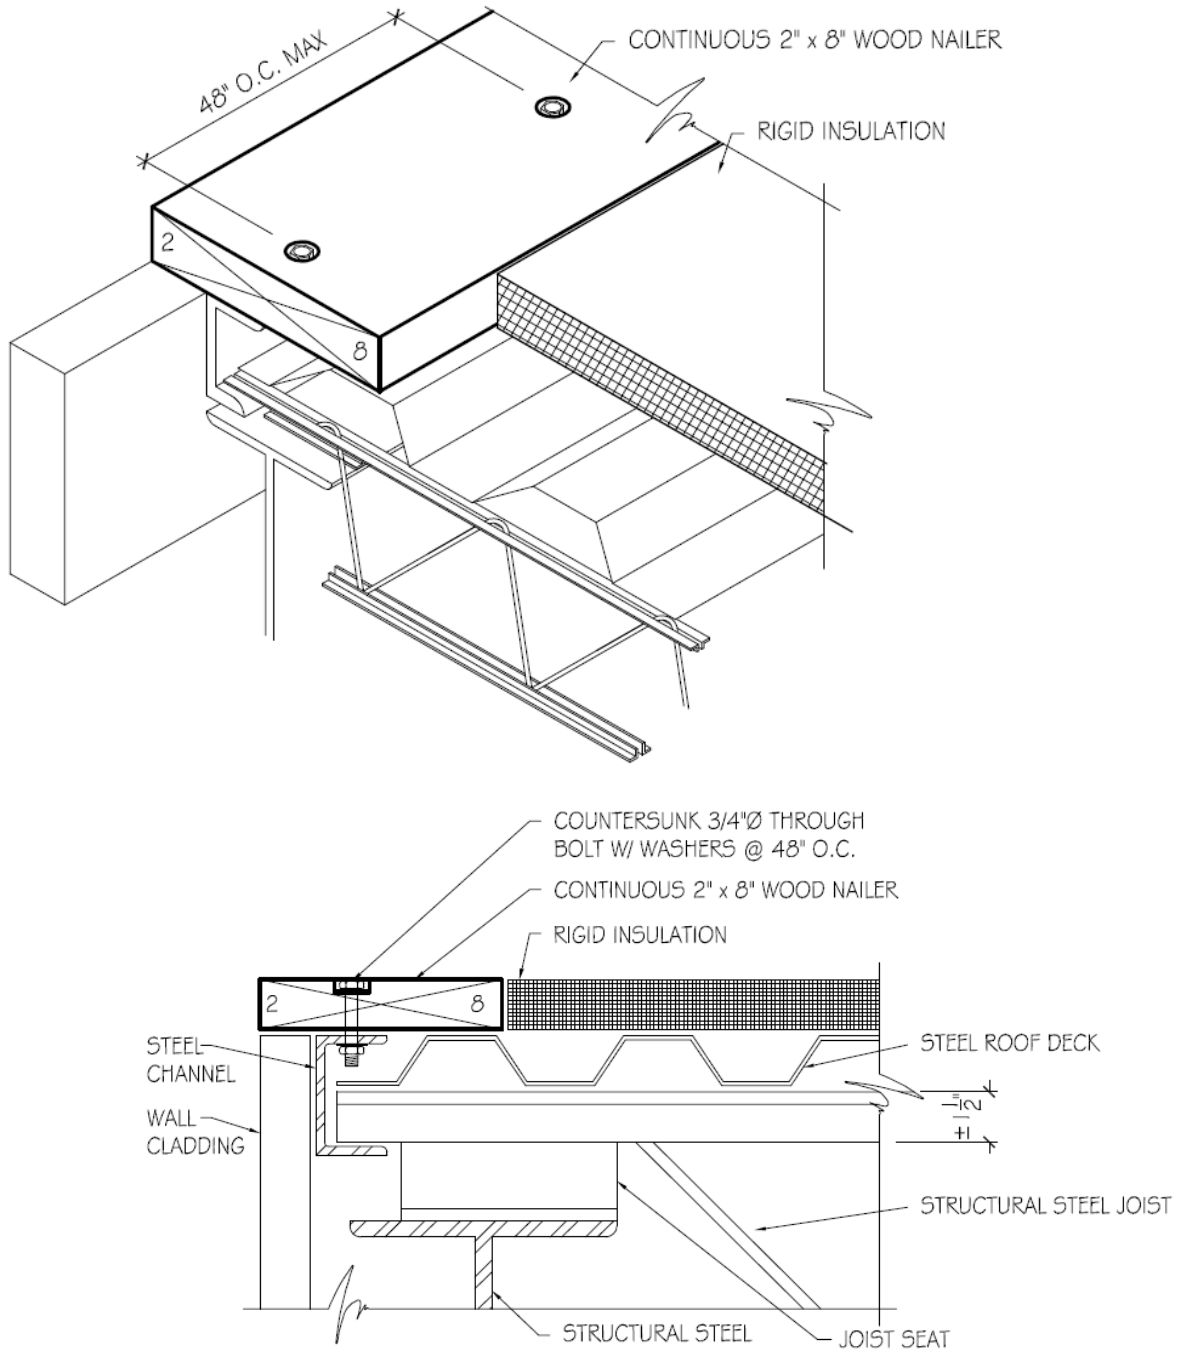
ROOF EDGE WOOD BLOCKING - THROUGH BOLT ANCHORS
